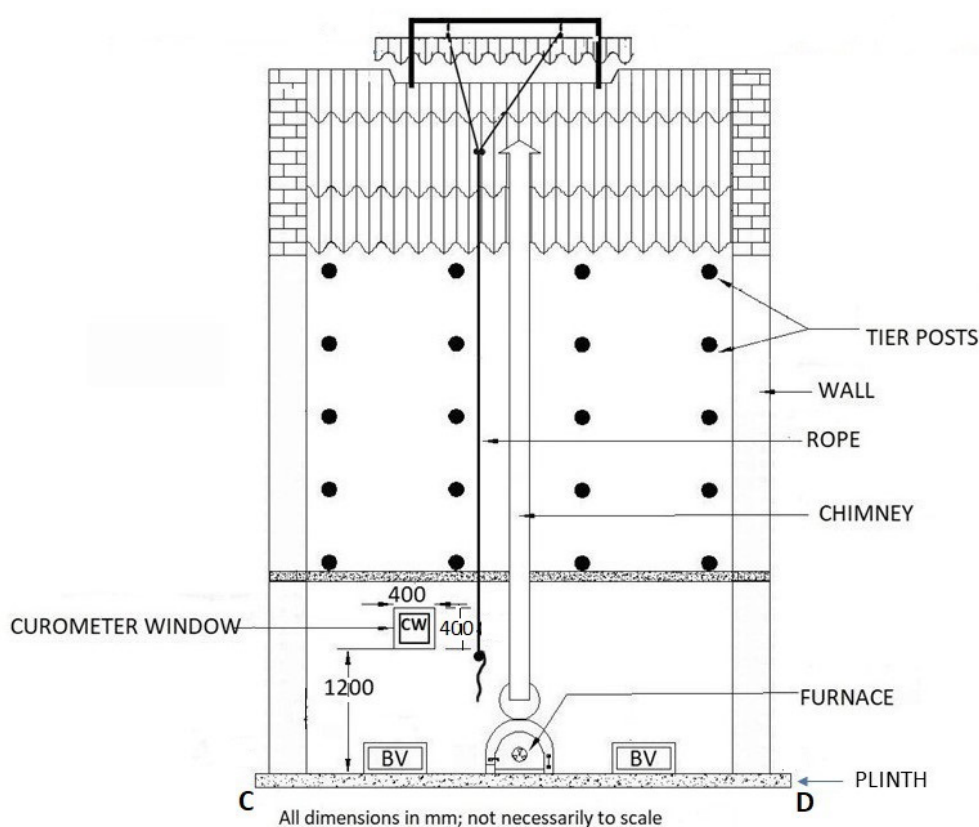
ELEVATION SIDE CD — BARN TYPE A
